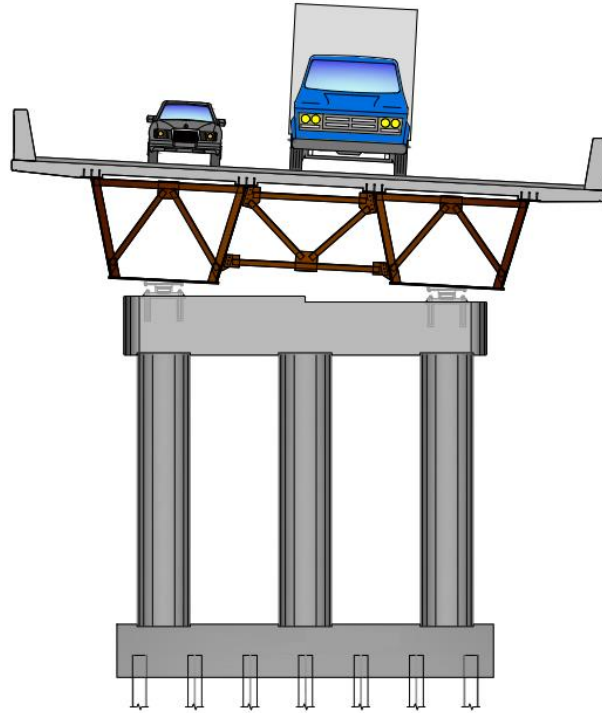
OVERPASS CROSS-SECTION (AT PIER)
